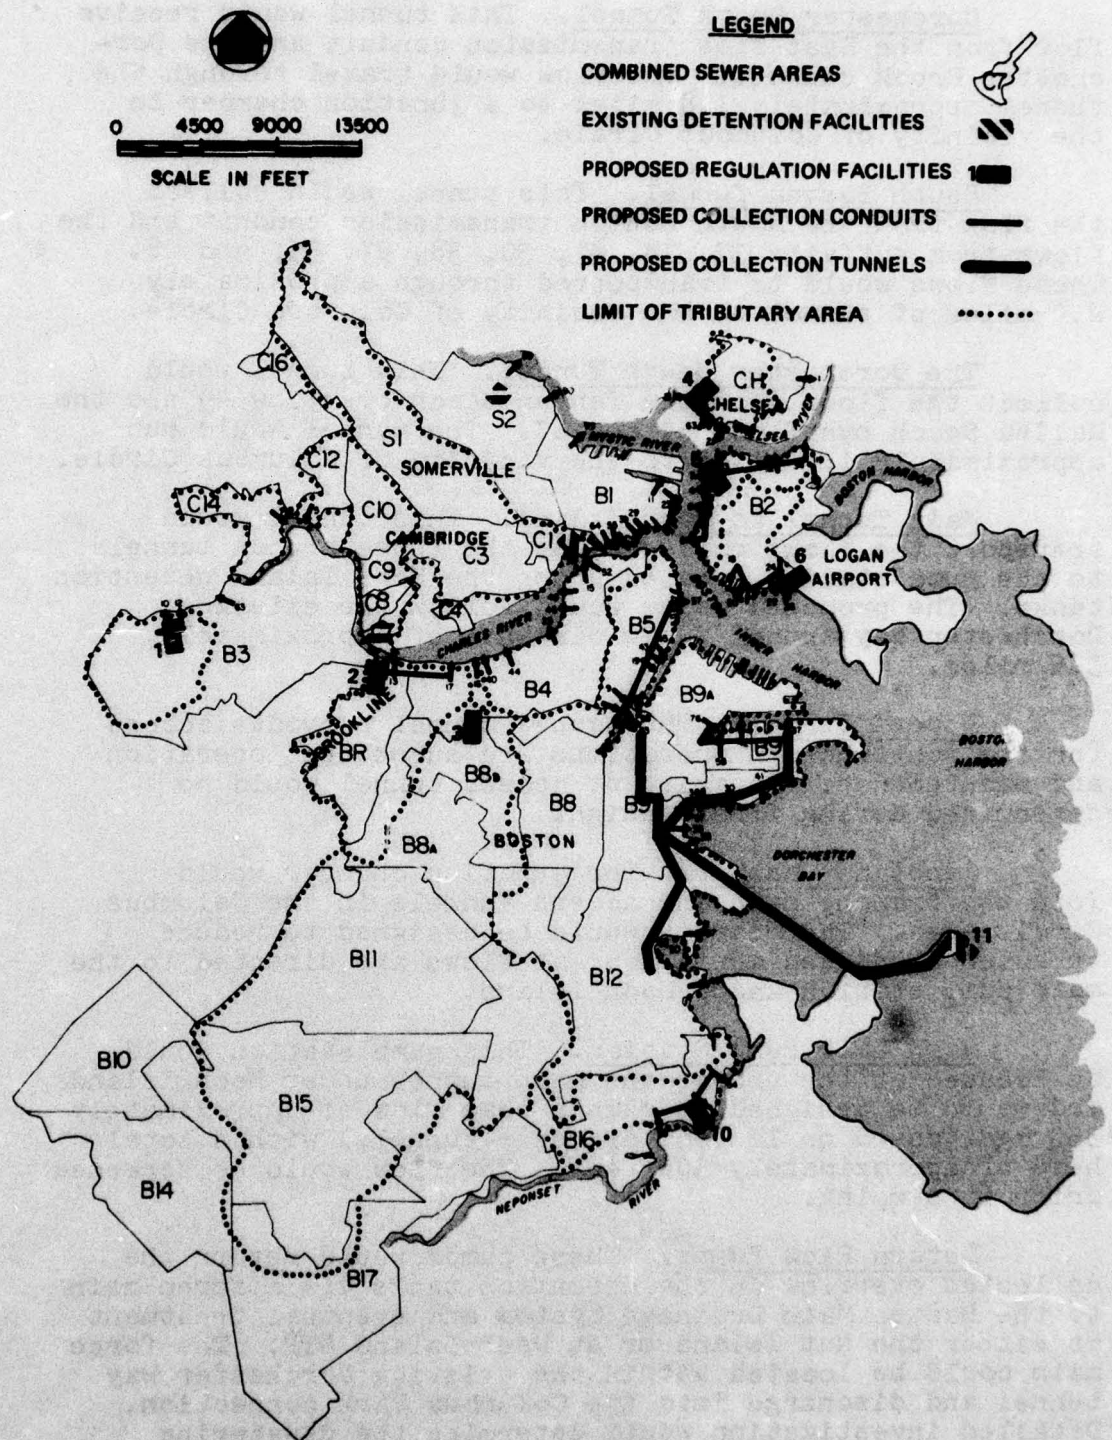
MOON ISLAND TUNNEL PLAN WITH SATELLITE REGULATION FACILITIES AND COLLECTION SYSTEMS IN ALTERNATIVE 2
